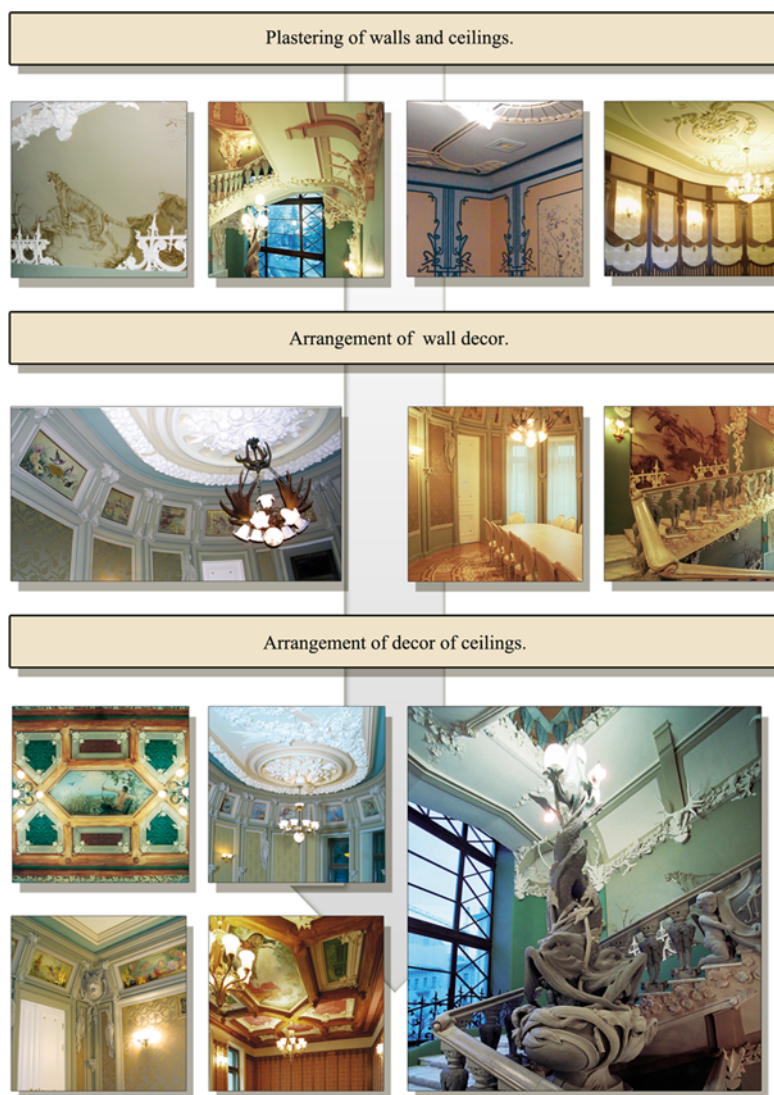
Restoration methods of the building of architect W. Horodecki at 10 Bankova Street in Kyiv
